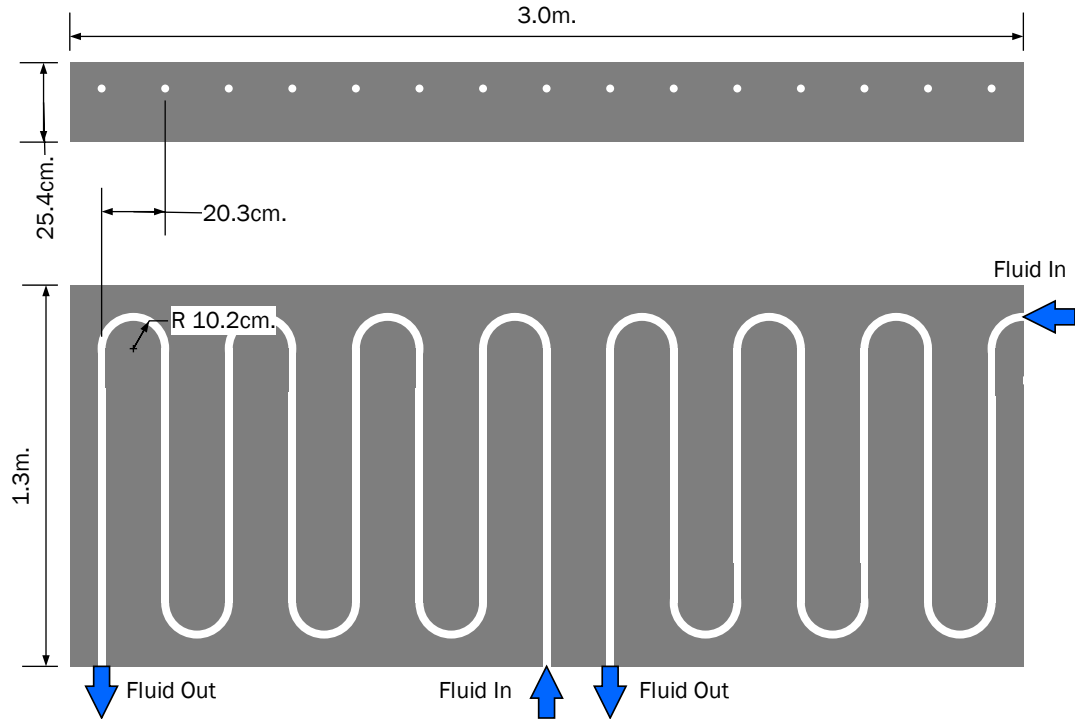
Plan view of the slab with circulation tubes spaced 20.3 cm (8 in) apart.
